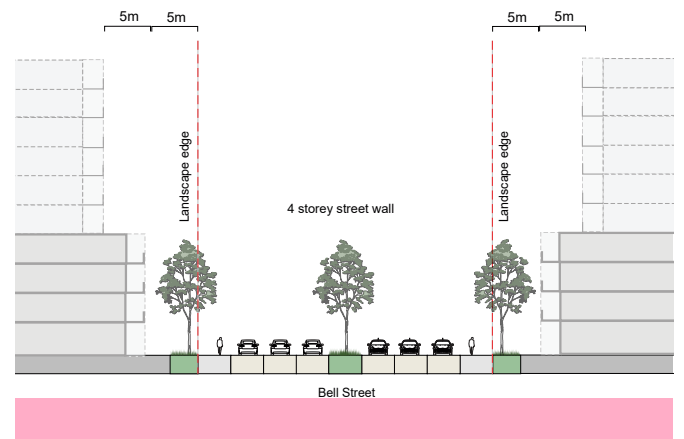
Bell Street, Bell Street Precinct. A 5m ground floor setback is proposed to manage amenity on this major road.
